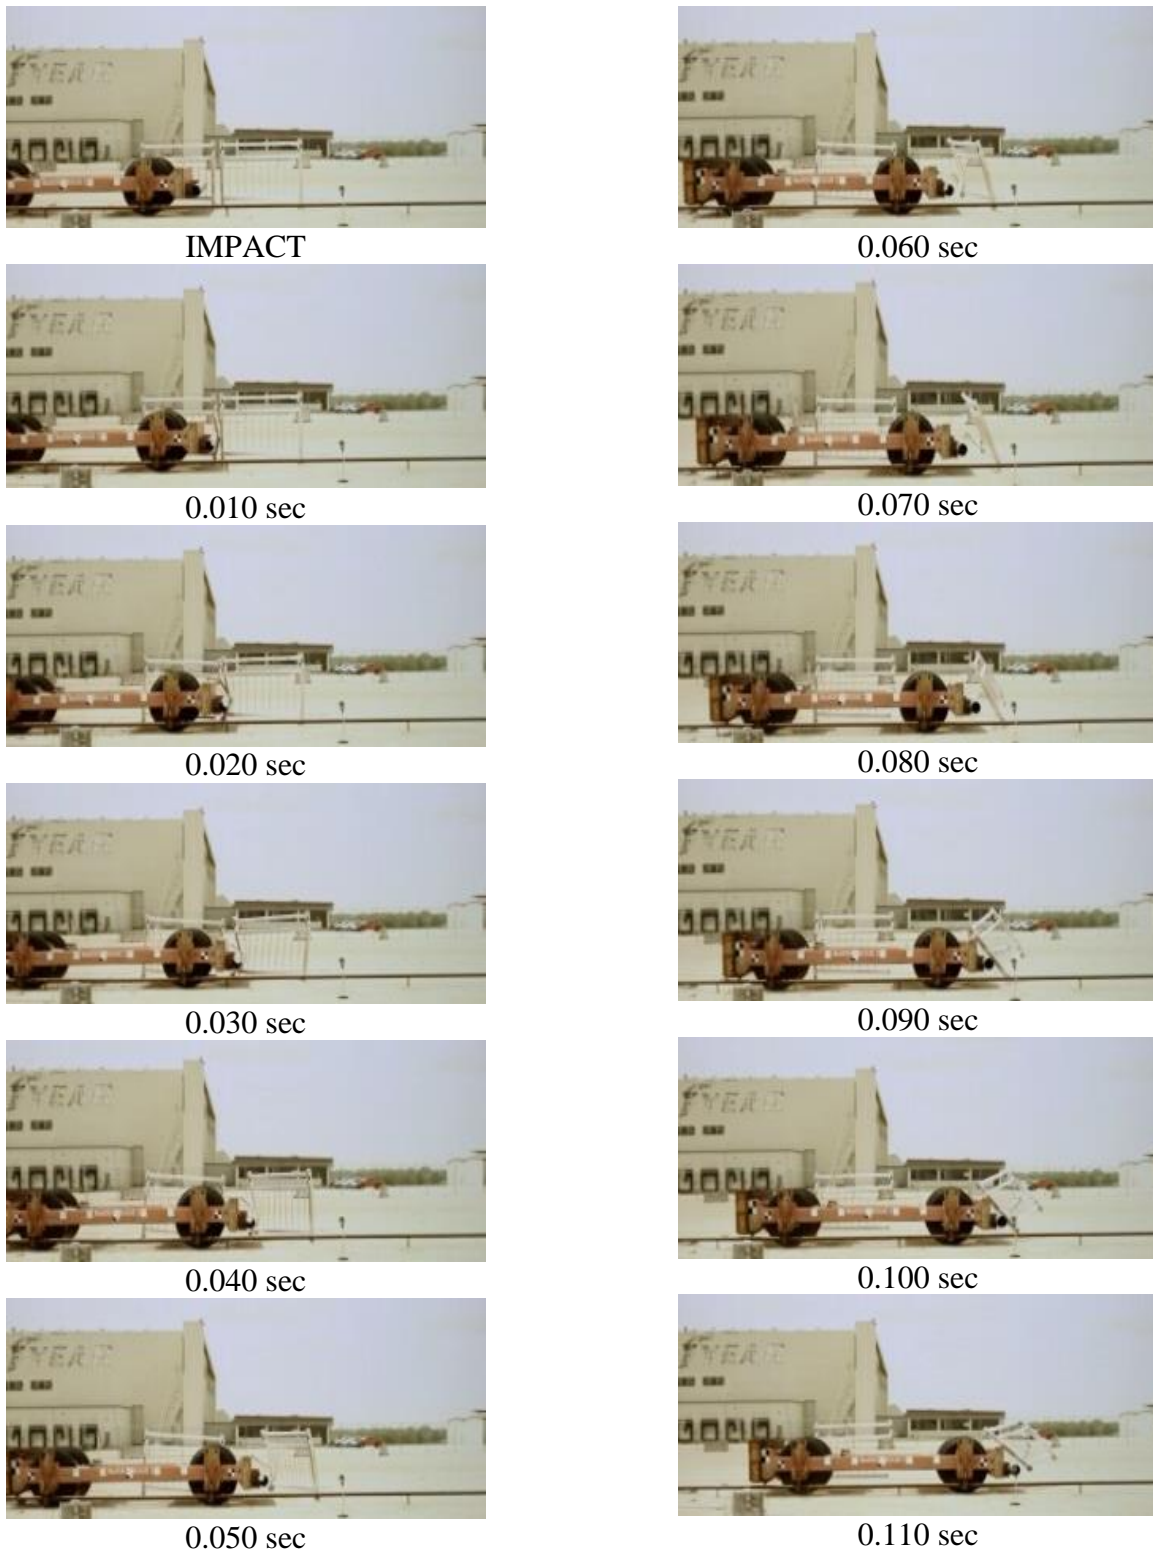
Time-Sequential Photographs, Run No. WIPR-2, Test No. WIPR-2-1
